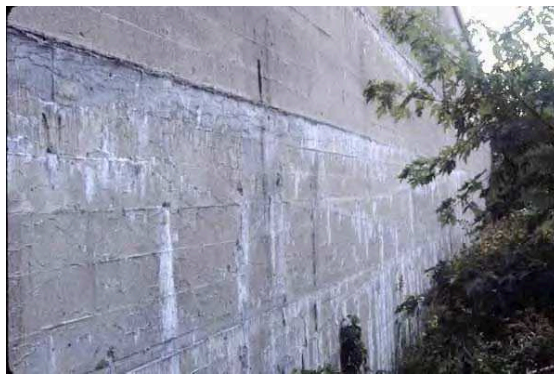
Illustration of efflorescence on concrete wall (from <http://www.concrete.org>)
